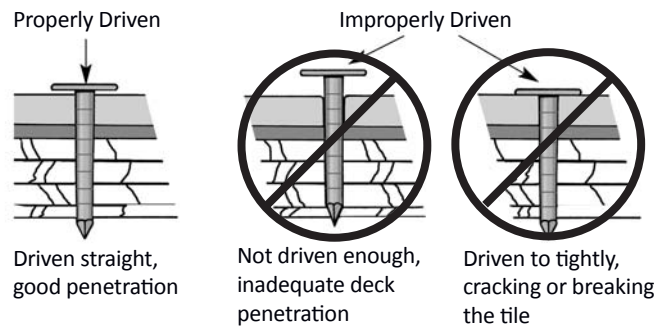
Proper Nailing Techniques for Plywood Decks
